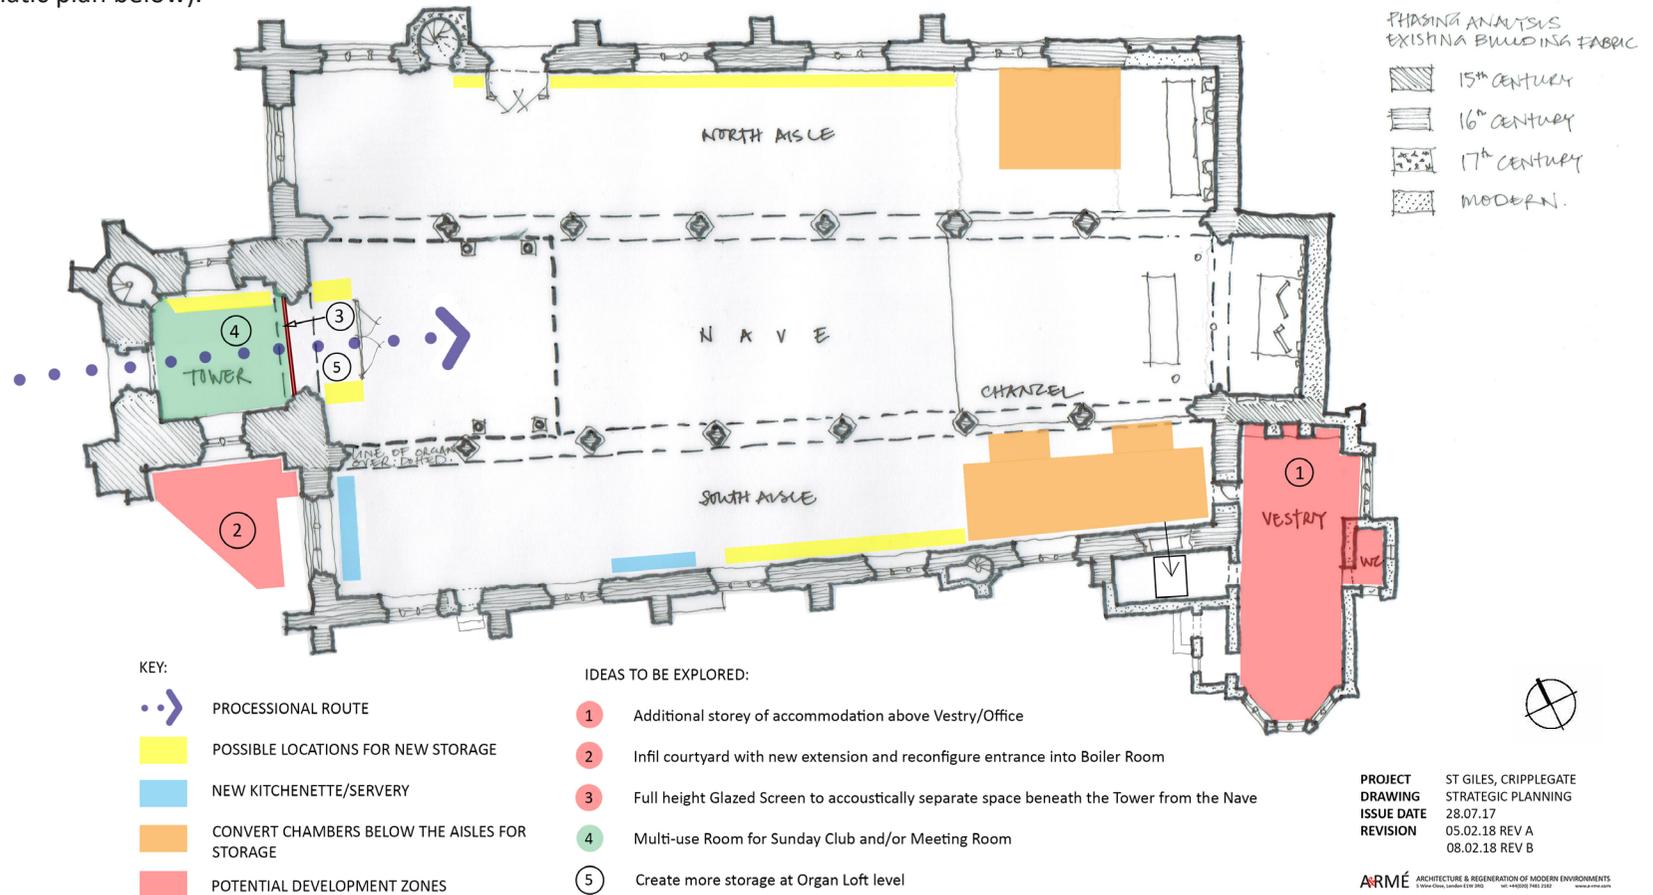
General Arrangement Plan of St Giles' highlighting areas of focus in the Strategic Plan
